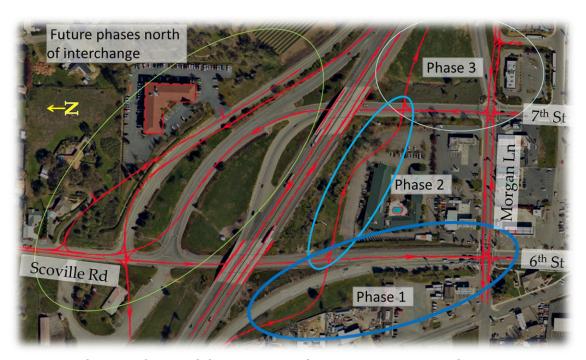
Phase 1 of Potential Future Interchange Improvement Plan
